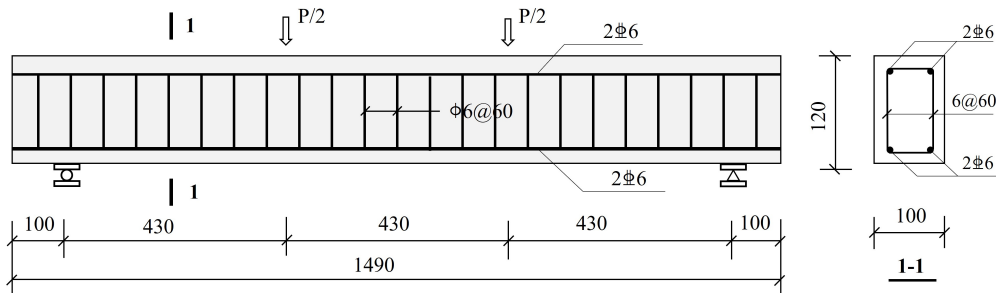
Load layout and geometry of RC beams under four-point bending (Unit: mm)
